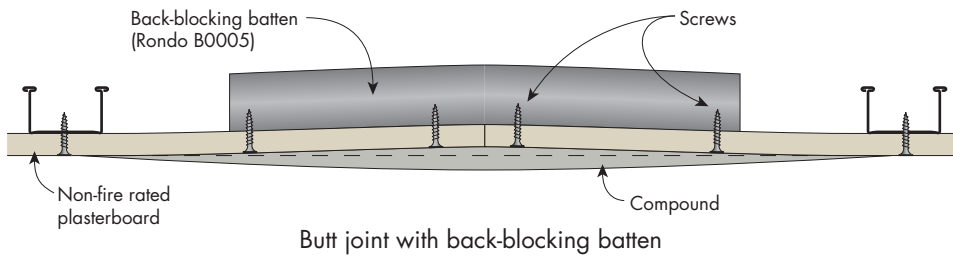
Creating a Recess at Butt Joints Using Back-Blocking Battens – Elevation
